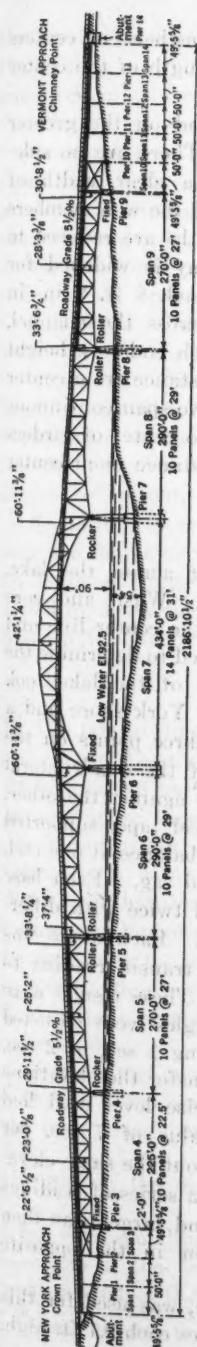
ELEVATION OF LAKE CHAMPLAIN BRIDGE SHOWING DEPTHS OF TRUSSES
